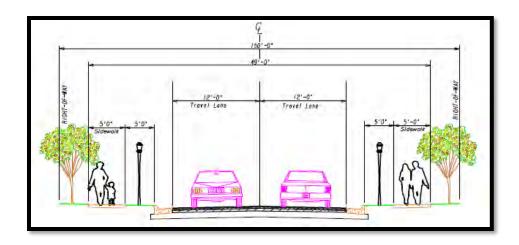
Proposed Typical Section – Alternative 2 – West First Street Extension
